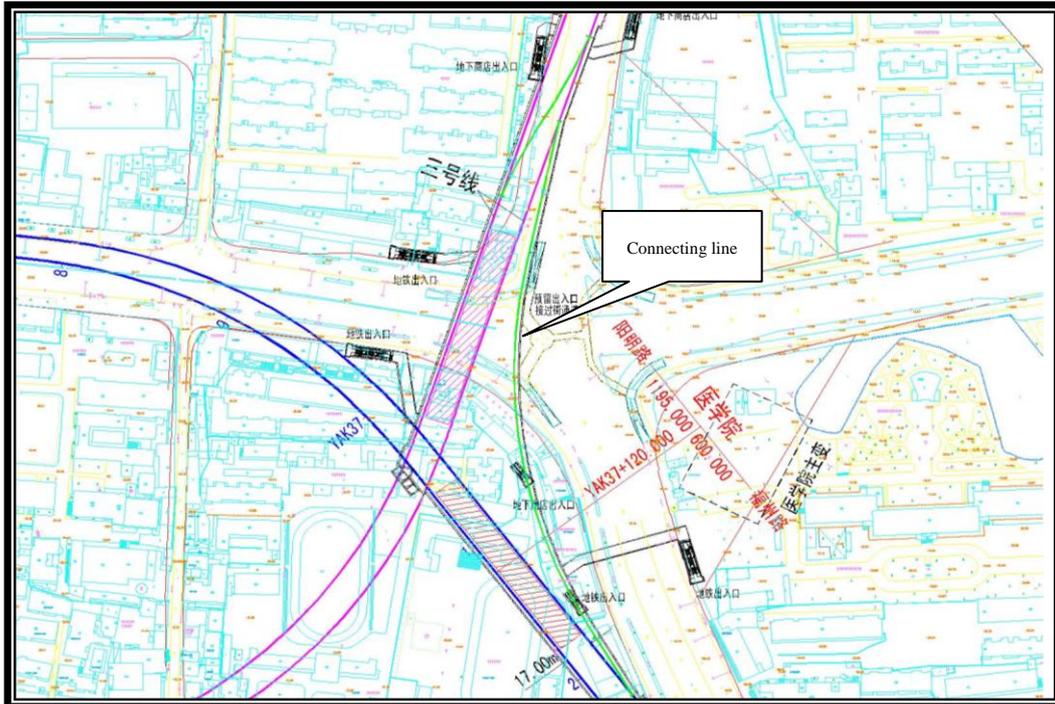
Schematic Diagram for Location of Connecting Line at Qingshan Road Station
